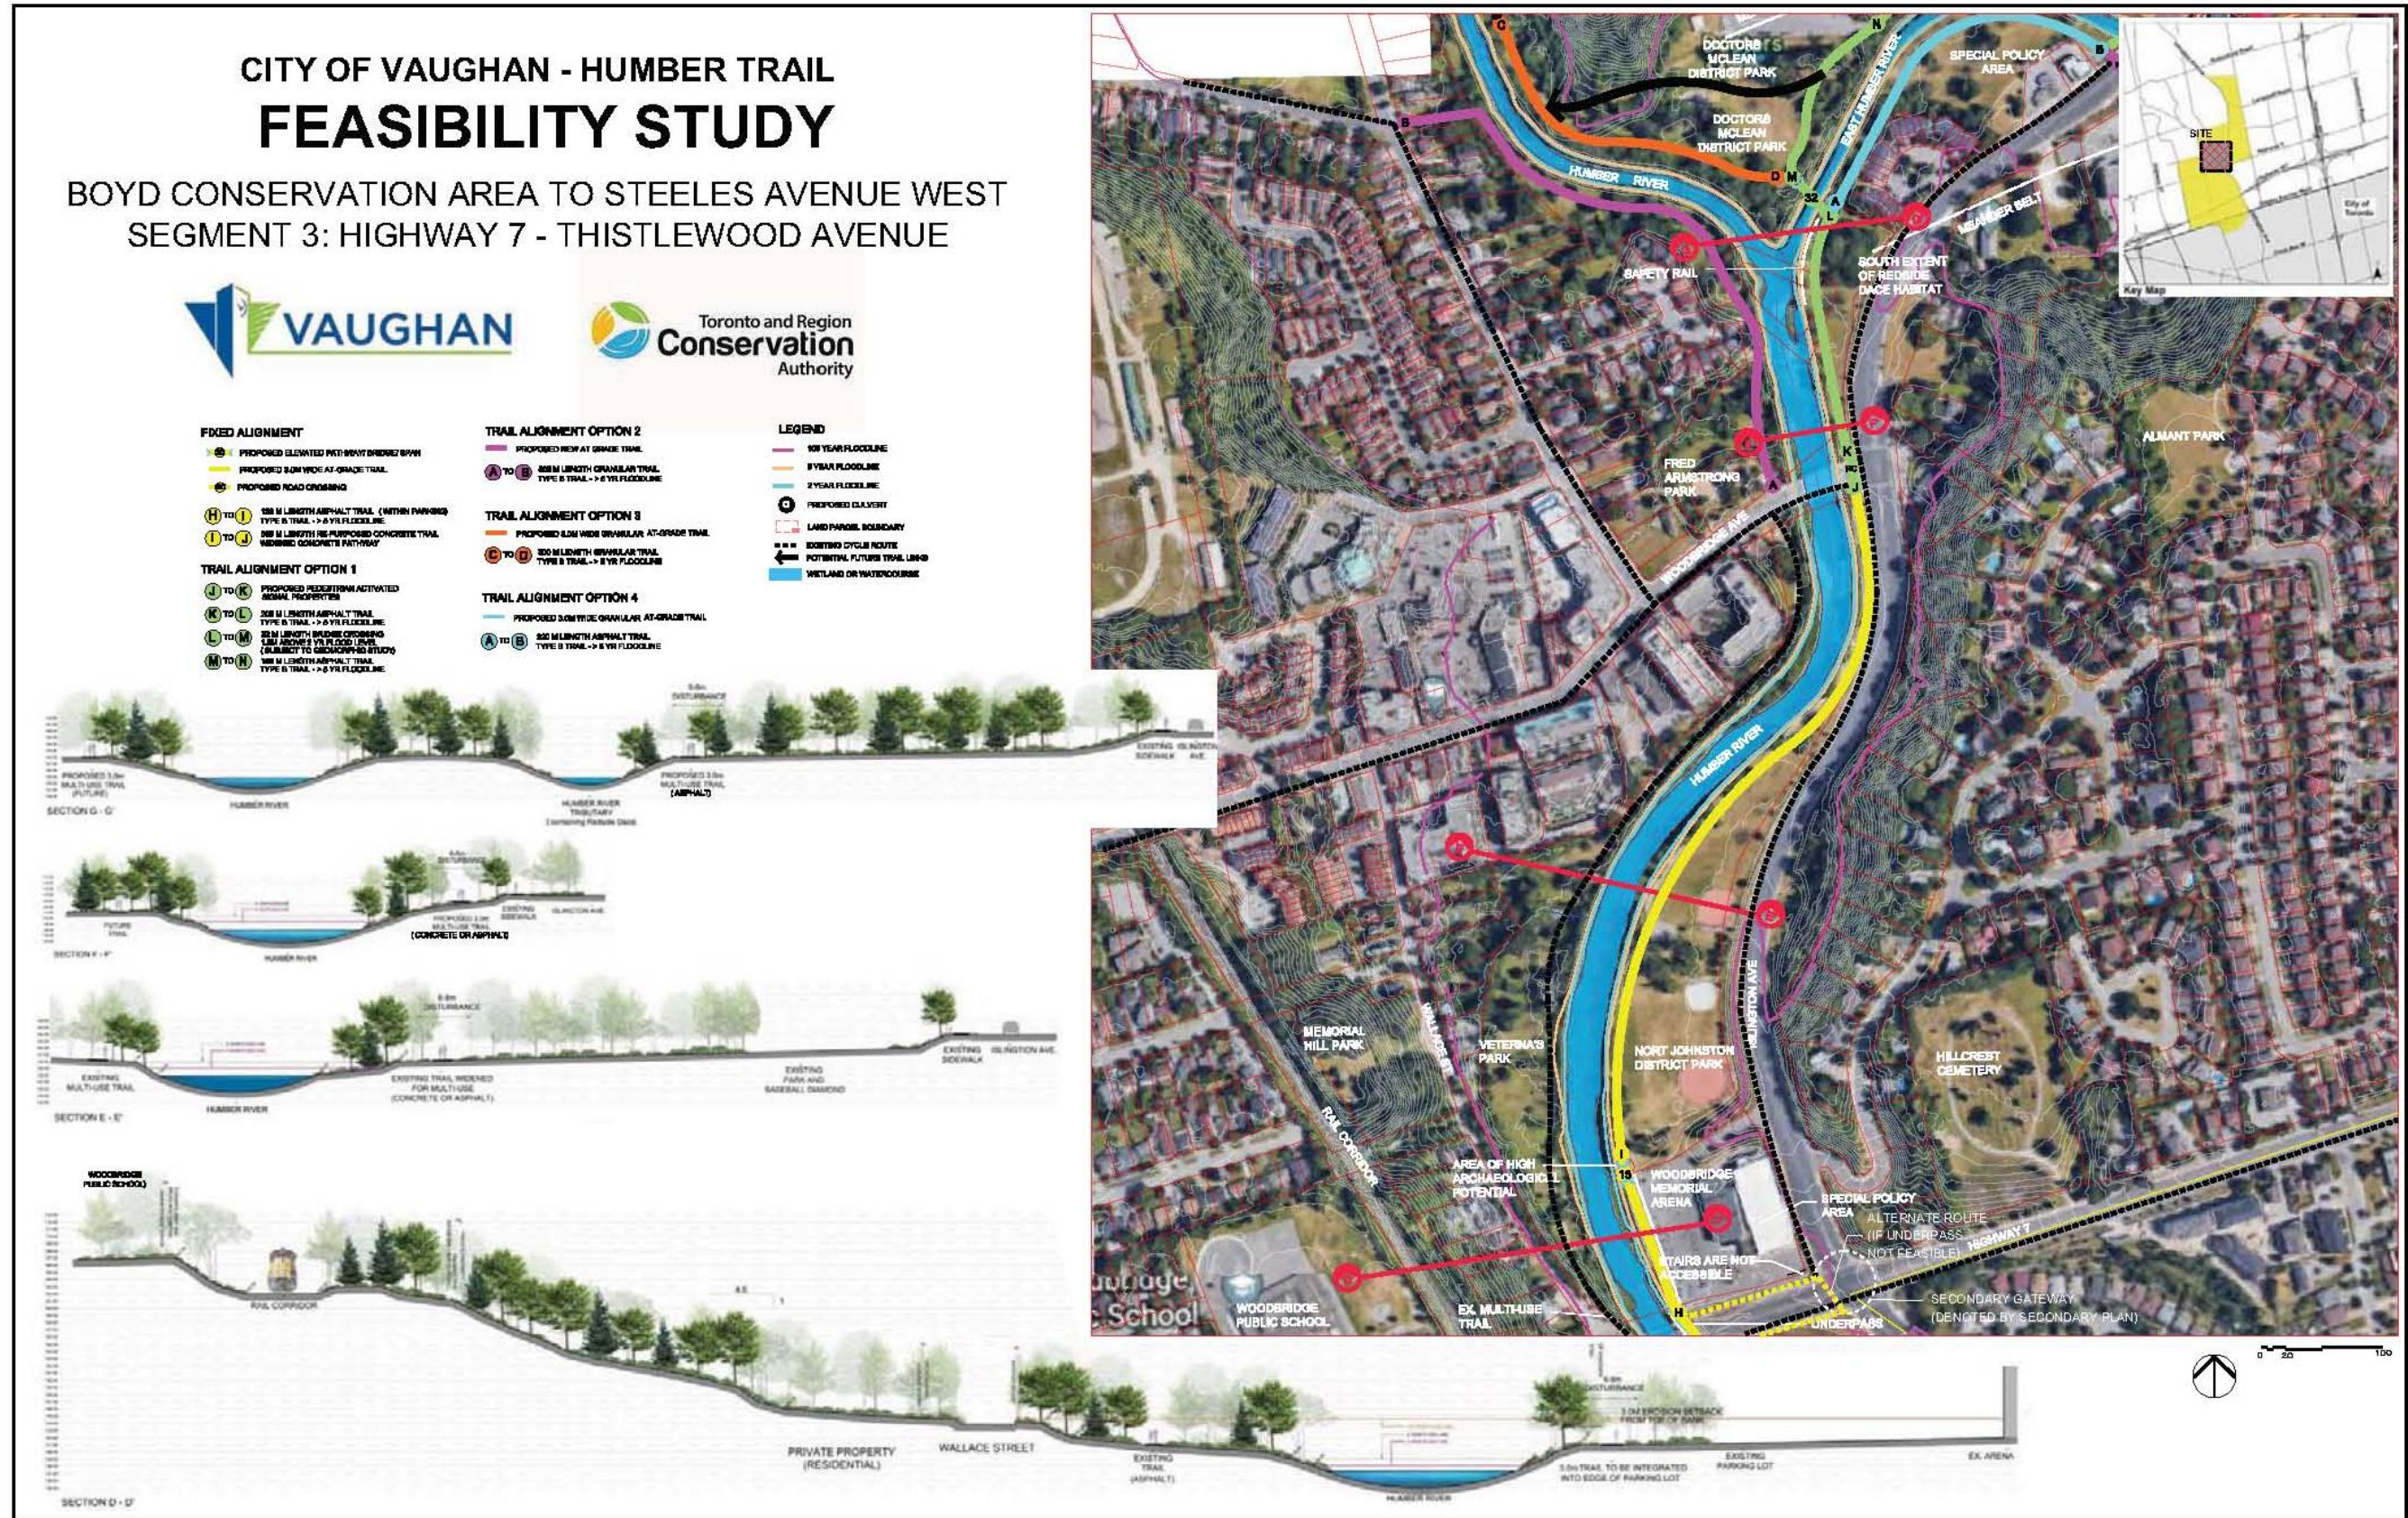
Segment 3: Highway 7 – Thistlewood Avenue
